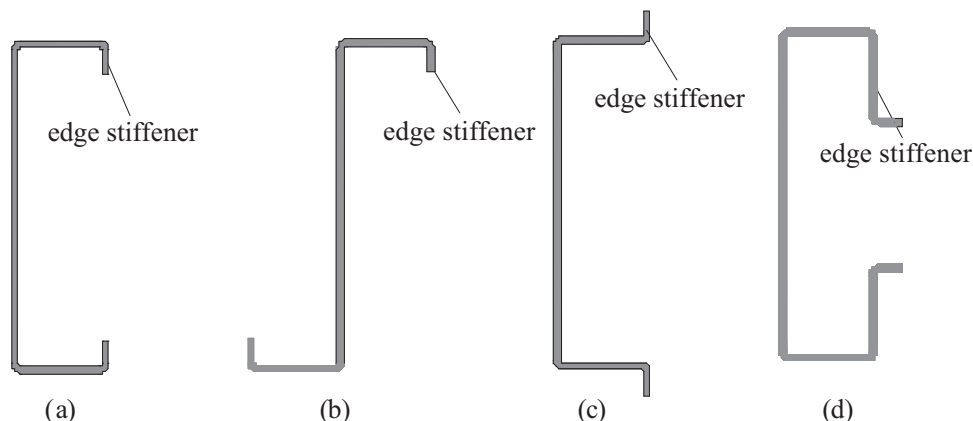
Edge stiffened cross-sections: (a) C-section. (b) Z-section. (c) hat-section. (d) rack-section.
